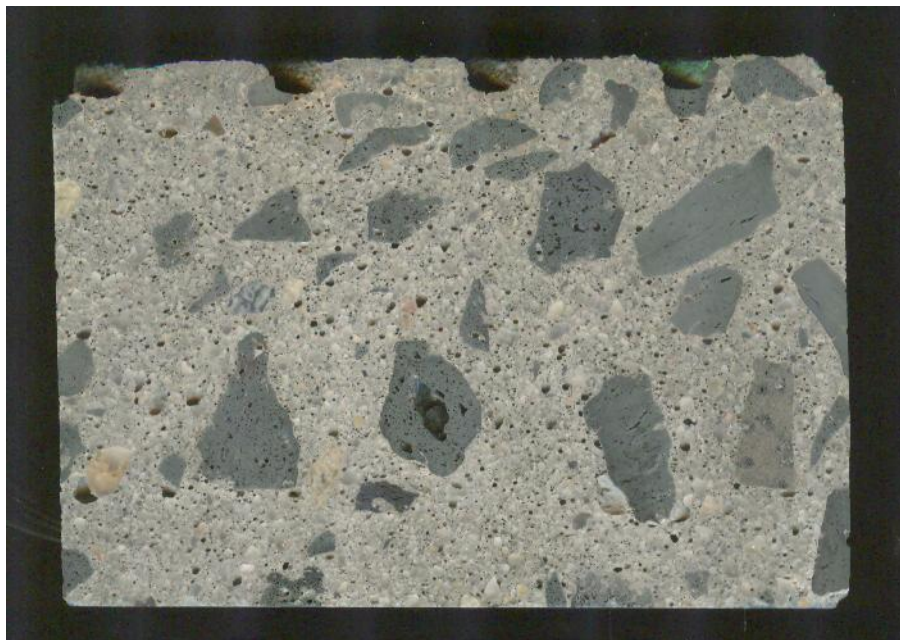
Scanned image of polished surface prepared from bridge deck 6L, core C-3. Bridge deck surface is at top.
